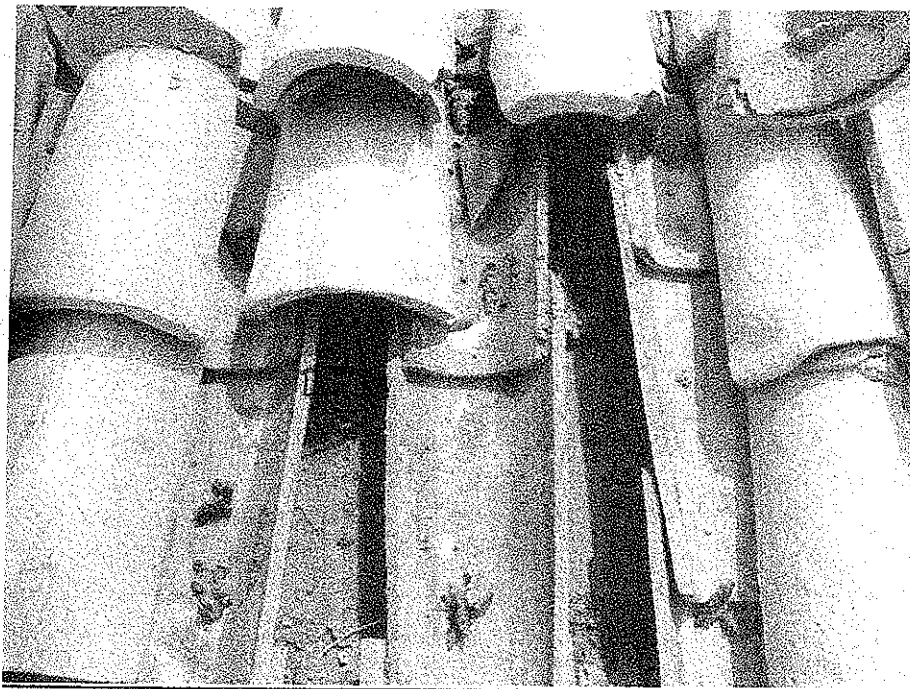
Roof Suite B, tile have no fasteners, the underlayment has fully deteriorated and not effective to keep rain water out.
